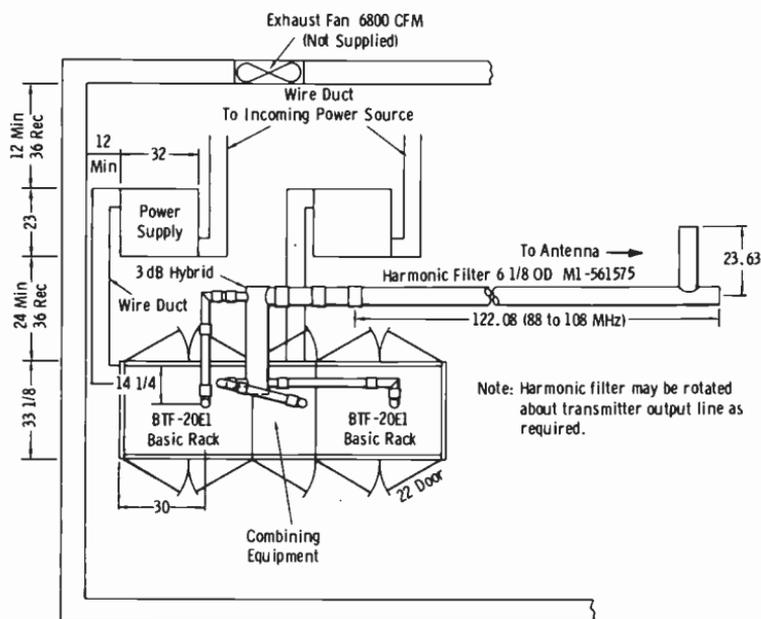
Physical layout of BTF-40E1 transmitter.
